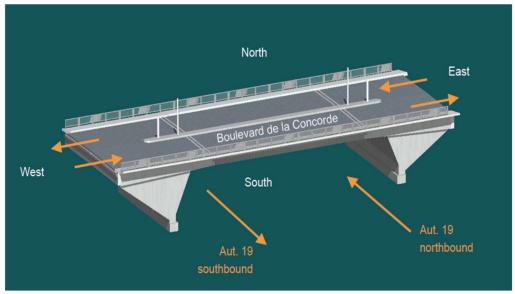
General Perspective of the collapsed overpass [1]
